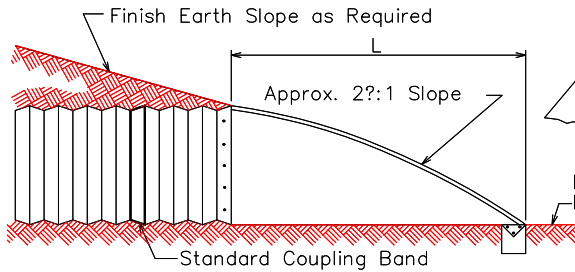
CULVERT-CMP FLARED ENDS-ROUND
